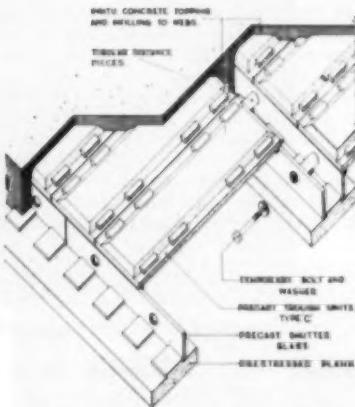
Details of Upper Floor of 1 ft. 7 1/2 in. and Greater Thickness.
